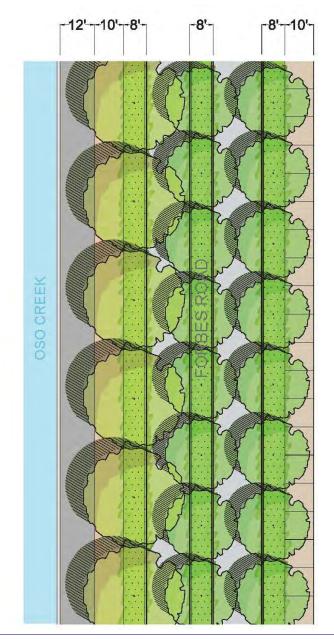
A Forbes Road, North of Crown Valley Parkway: Typical Plan View, Character, and Plant Palette
